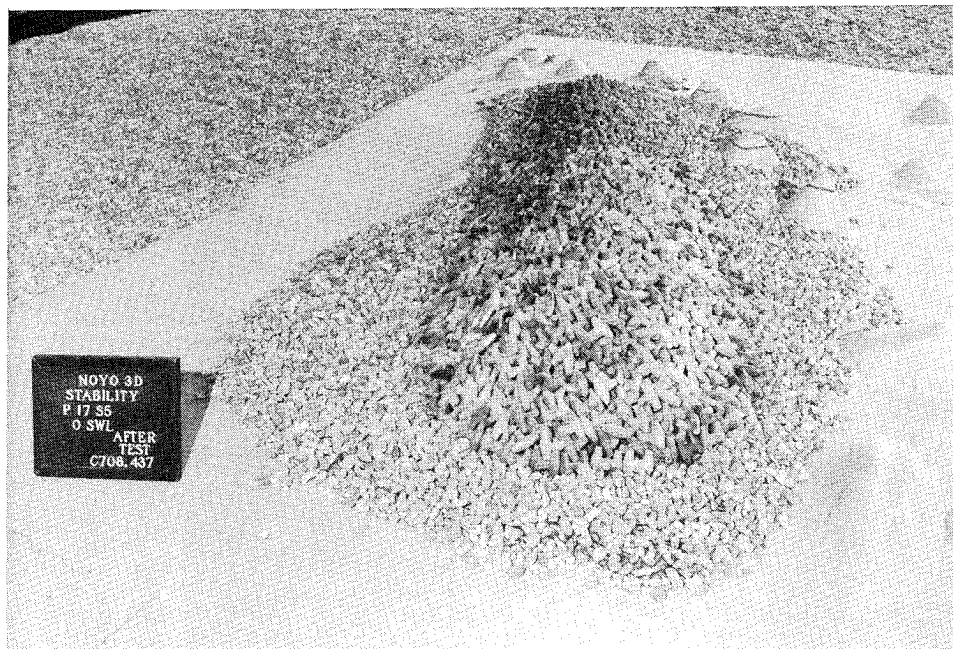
Plan 17, north roundhead after five series of modified Storm IB waves at +0 m mllw
